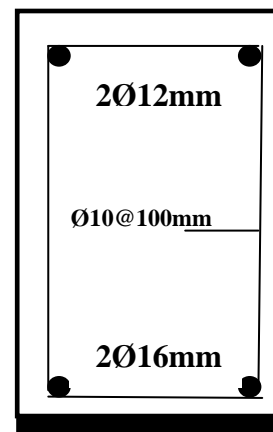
Details of the tested beam failing in flexure with (a/d=3)
